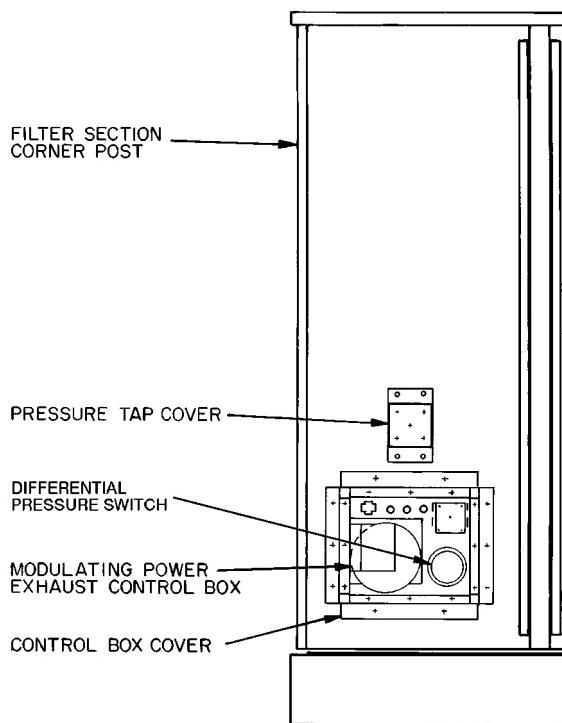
Location of Modulating Power Exhaust Control Box — VAV Units
